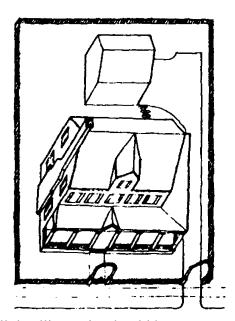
The front entrance of fifty (50) of all dwelling units should have a covered front entry porch, preferably raised a minimum of two feet above ground level.
